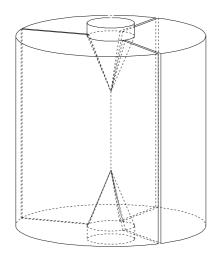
Barcelona test mechanism of failure and failure surfaces
